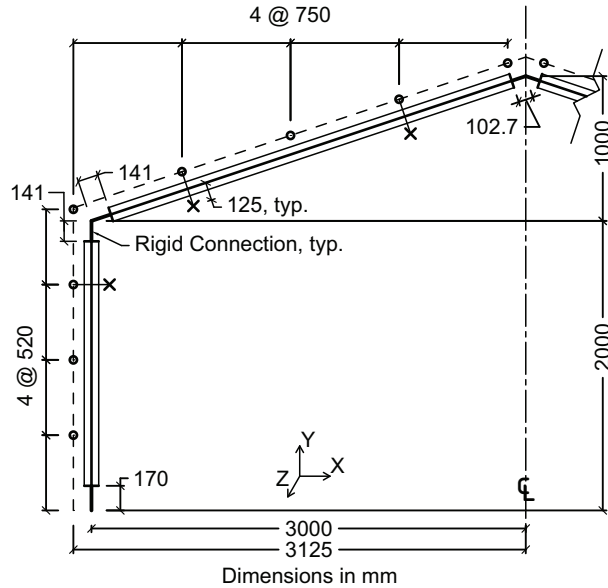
Single channel portal frame geometry. Dimensions shown are symmetric
